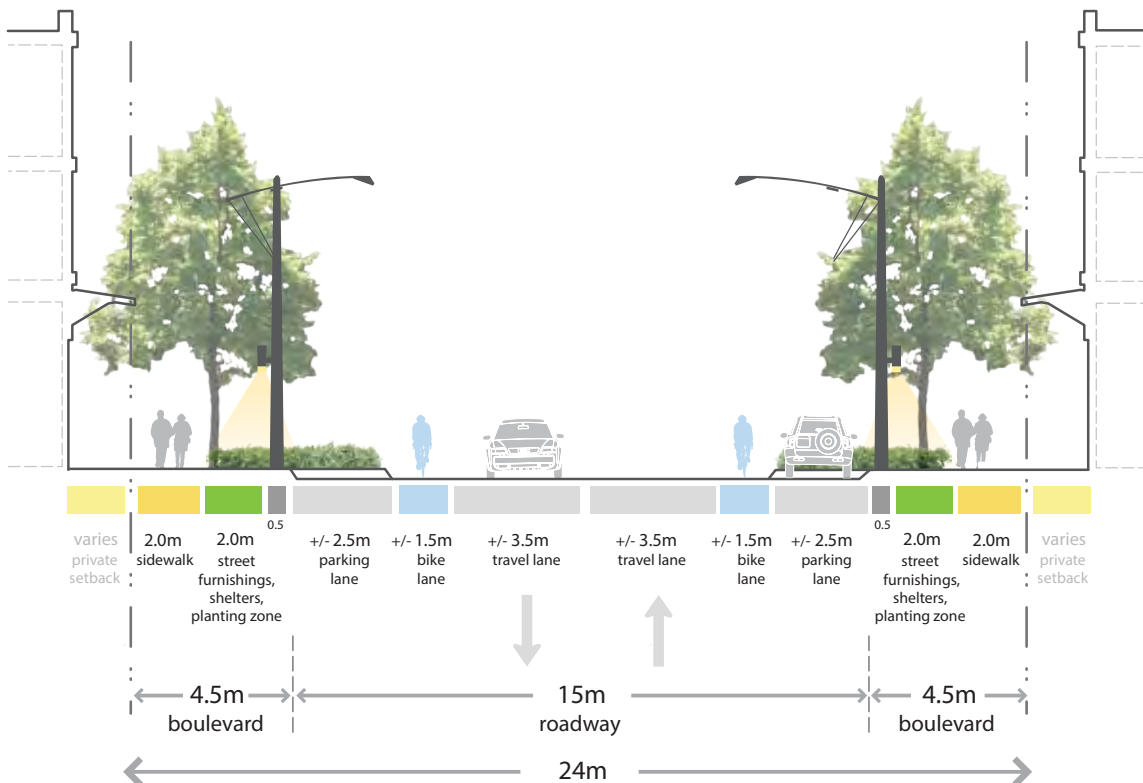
Cross section of proposed Midland Avenue street improvements
